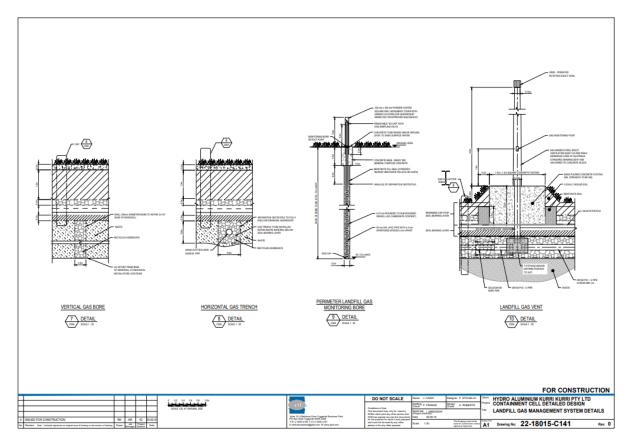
Gas collection system details in elevation views (GHD, 2018)
